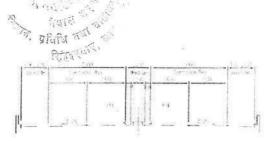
Typical Cross Section of Bridge Section (Bypass between Nalinchowk and Sanga)
